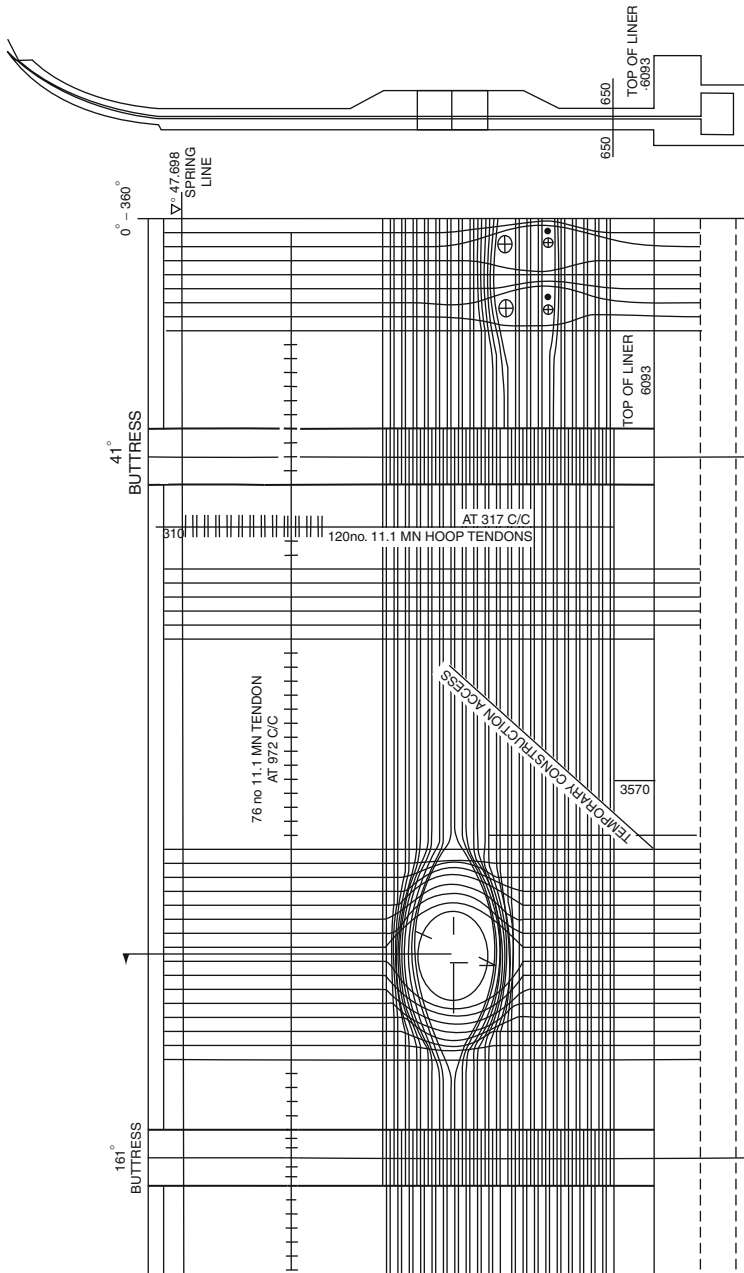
Developed elevation (section-right) showing tendon layout 0°–180° (all dimensions in mm except reduced level) (courtesy of CEGB and Sizewell Task force)
